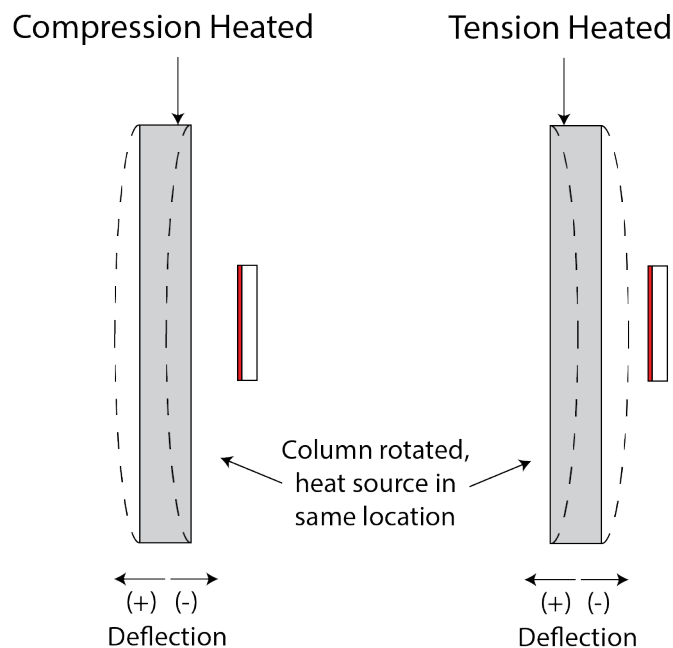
Test setup illustrating the relative displacement of “compression heated” and “tension heated” concrete columns
